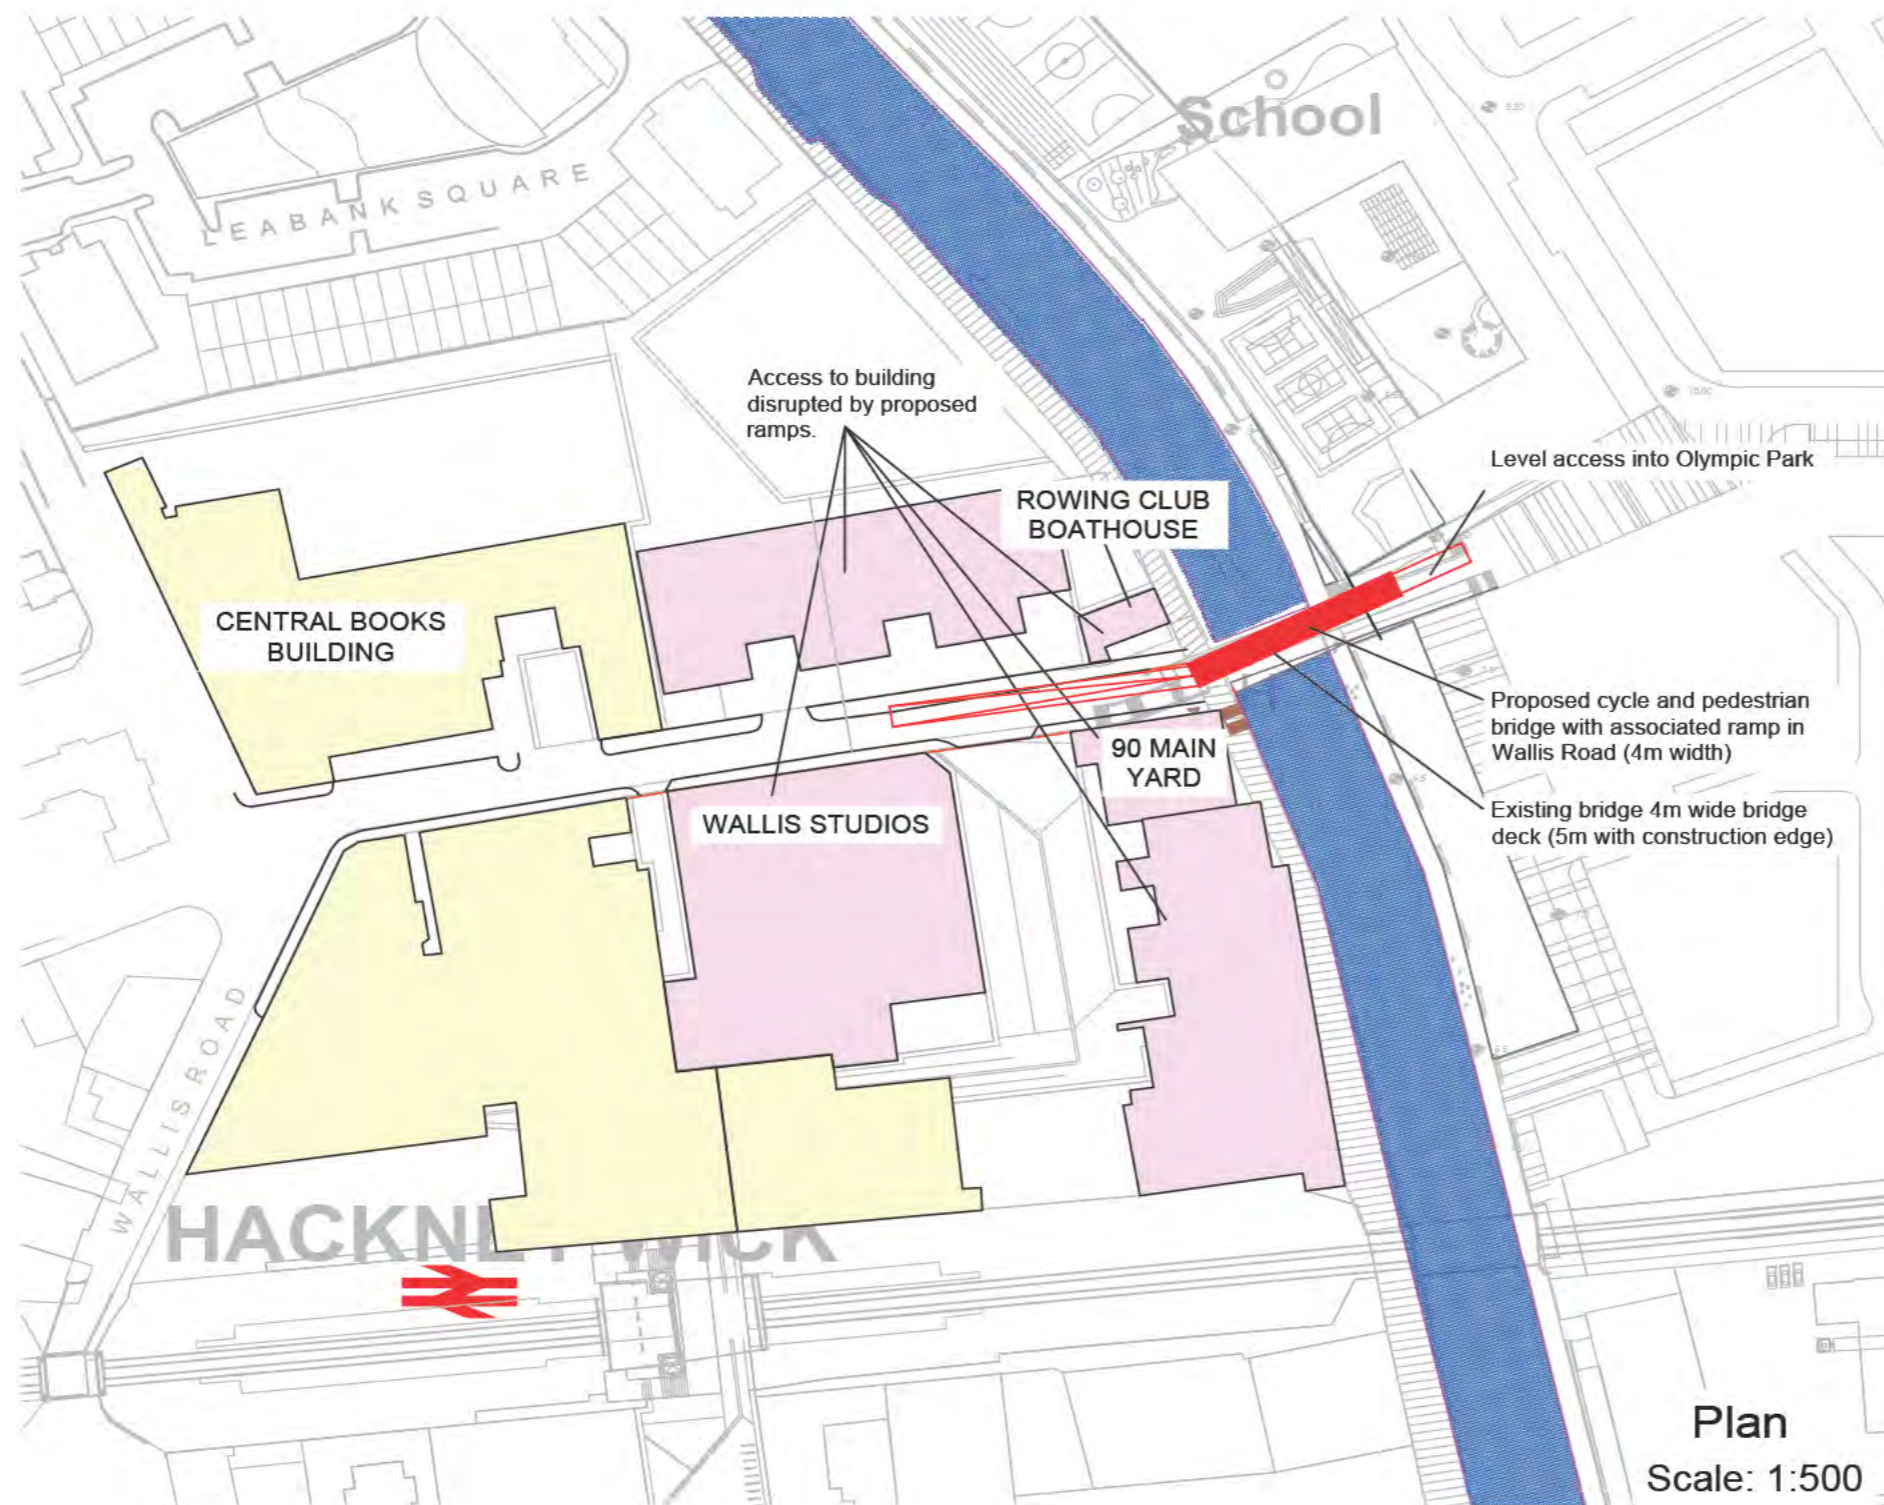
Wallis Road ped/cycle bridge Option E
